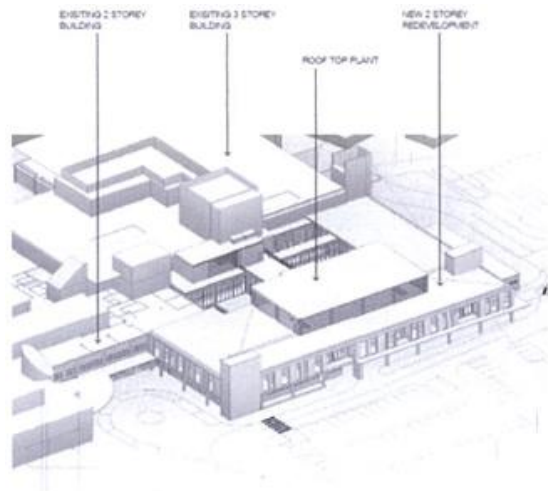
below shows the western side of the site from the Kingsway entrance. The new building areas are shown in colour and existing building areas shown in grey and white. This shows the final proposed layout of the roads and final configuration of the car parks. The car parking and road configuration works have previously been approved under Part 5 of the *Environmental Planning and Assessment Act 1979*.
